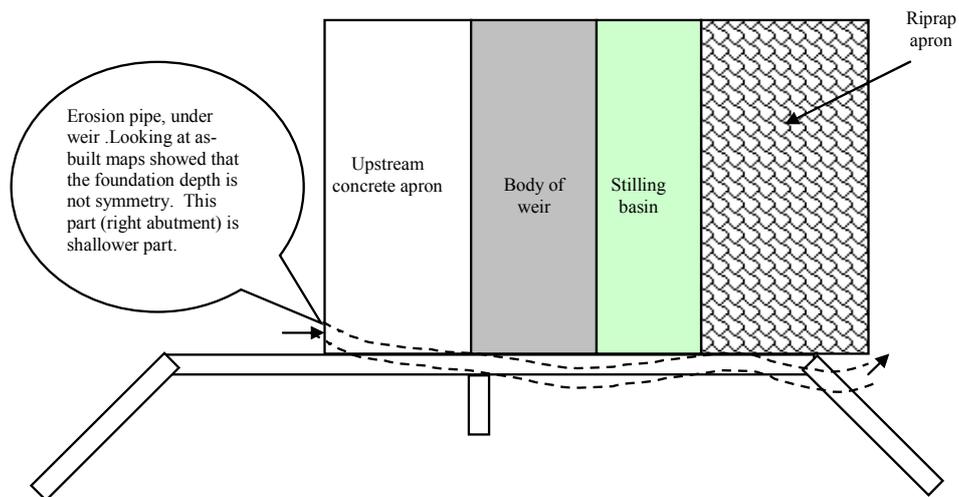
The location of seeping pipe under right abutment and concrete body on the plan veiw.
